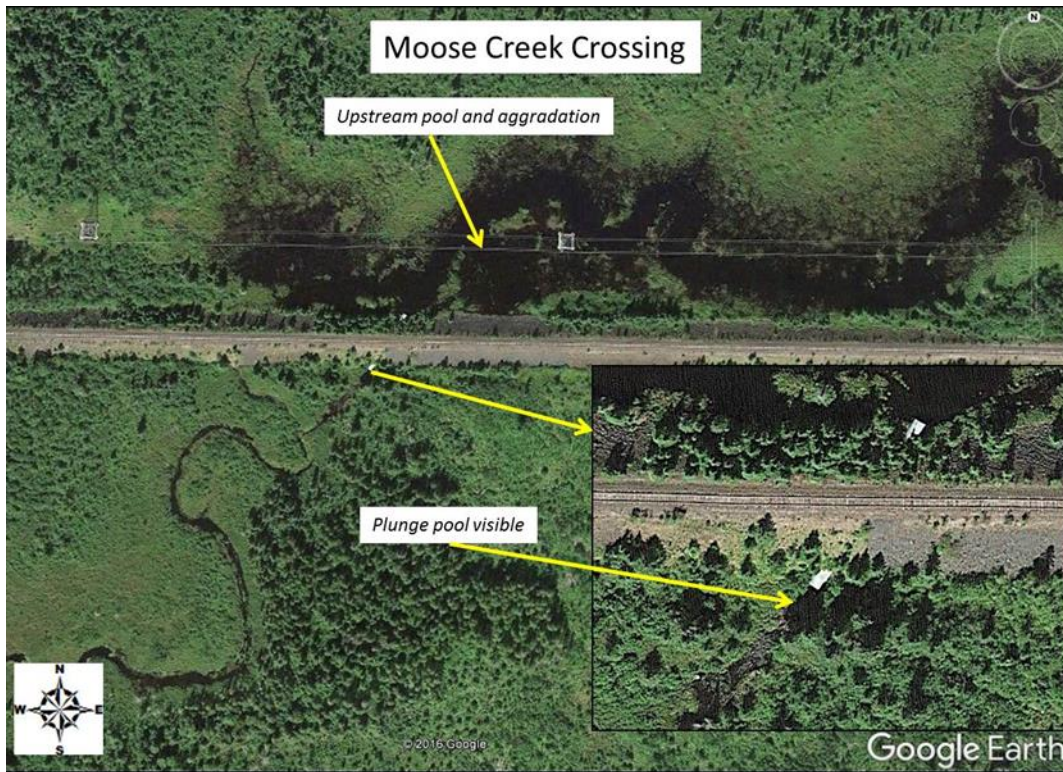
Aerial photo of Moose Creek RR crossing, showing plunge pool and large ponded area upstream.
